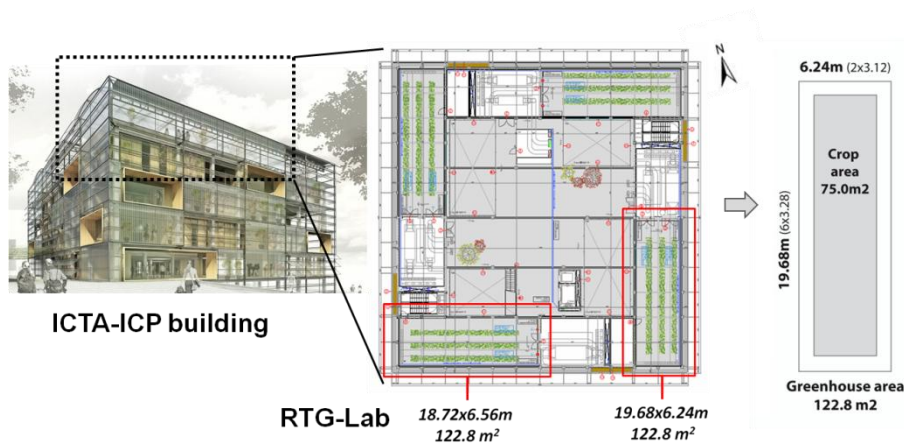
Layout of the RTG-Lab, situation in the ICTA-ICP building, and rooftop greenhouse dimensions (The RTG elements are detailed in Supporting Information 1).
